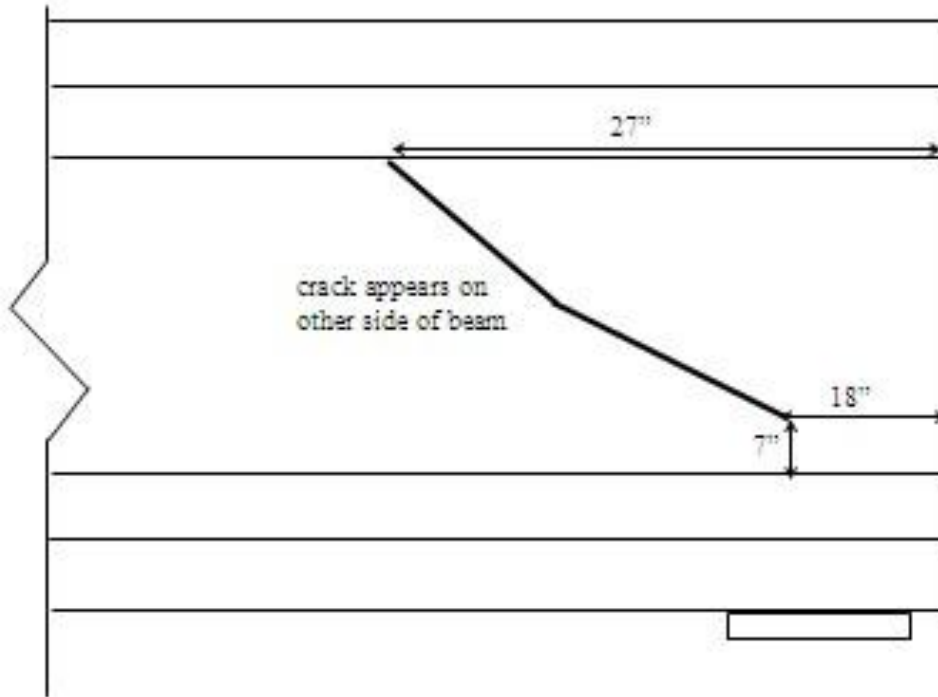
Crack diagram for south span girder, 6th beam from west side, west face, south abutment (#7933).
